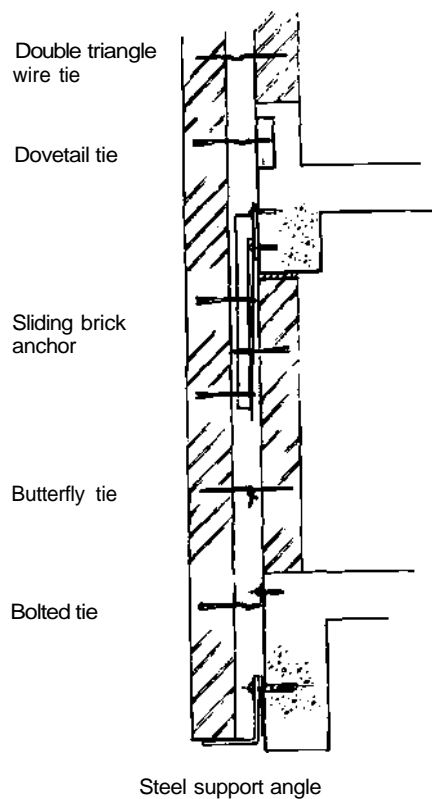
Typical detail of brick facing to concrete brick or block
